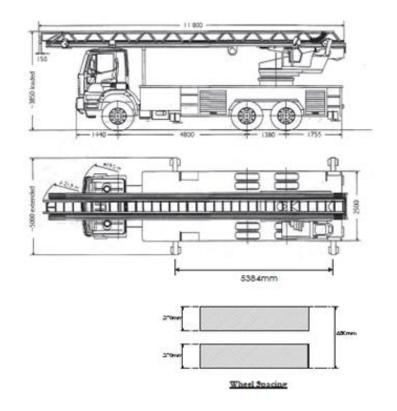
ACCESSWAY (WHEELS & JACKS LAYOUT)
